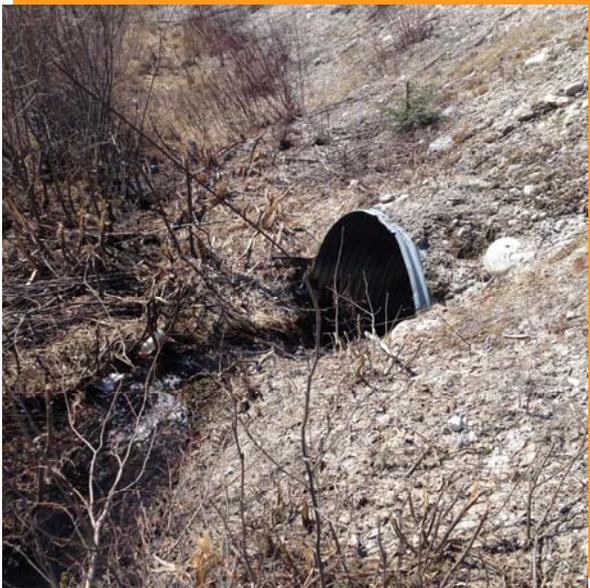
4+180 – TTOG 1800 – Entrance culvert
